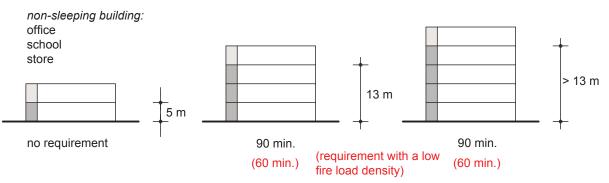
Requirements for the main load bearing structure of non-residential buildings Source: Verdiepingbouw met staal Redrawn by the author
